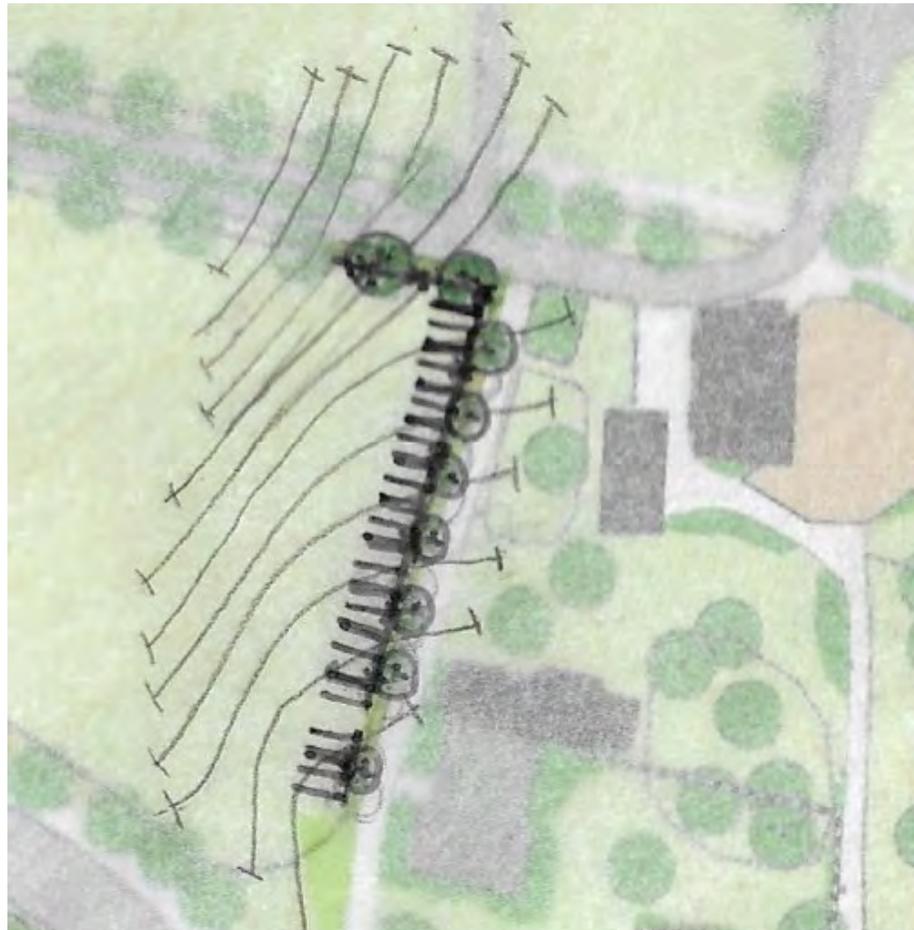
Potential conversion of 23 parking spaces along the east edge of Encore Hill parking would require grading and stabilization of the turf (QE, 2020).
